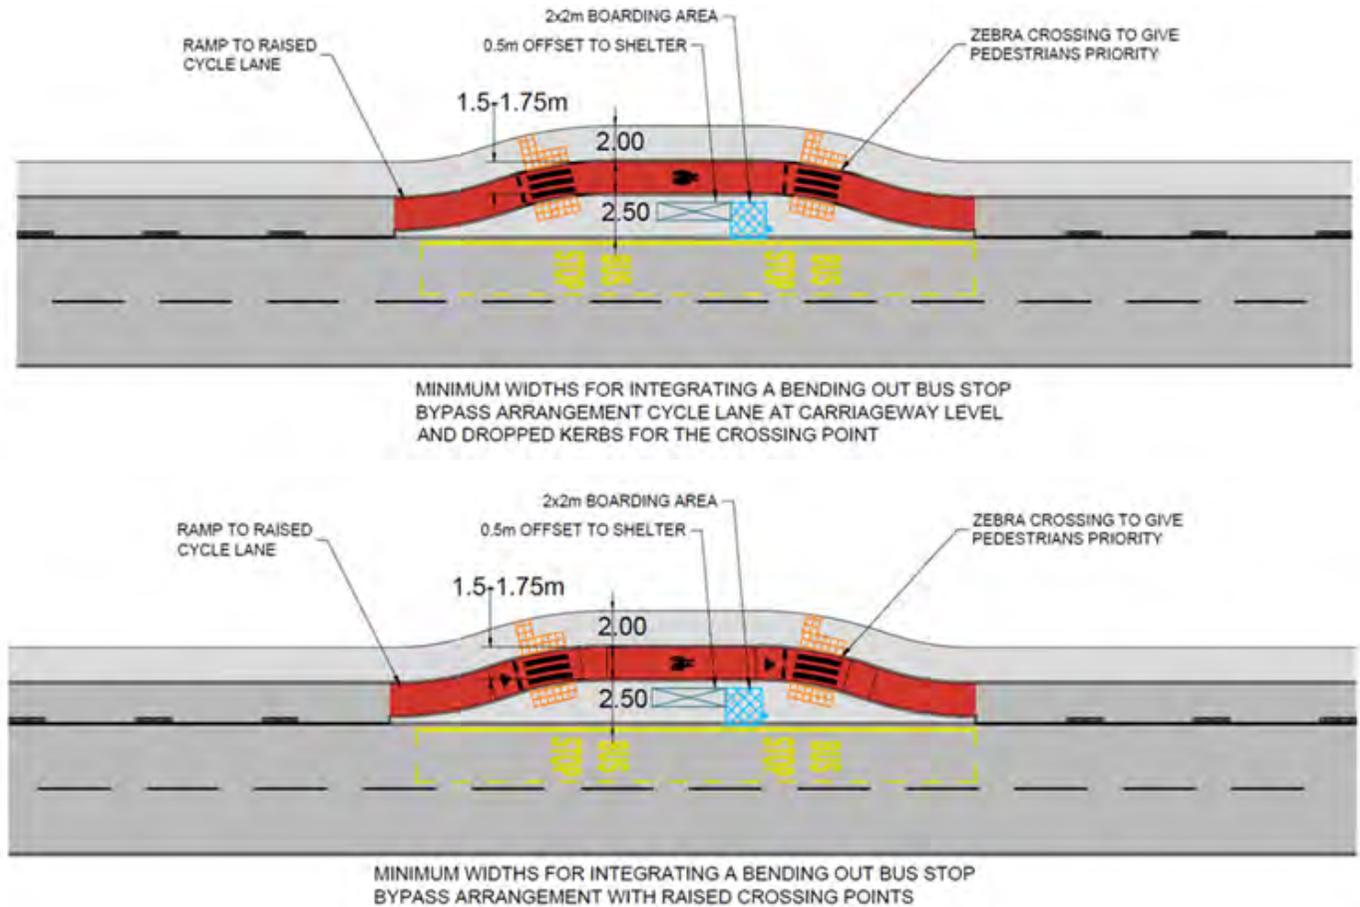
Schematic images of bus stop bypasses where footway has space to bend out to create extra street space.
